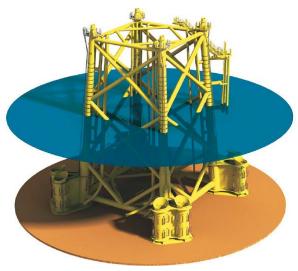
Borkum Riffgrund North Sea offshore substation jacket structure; Jardine et al. (2015).
